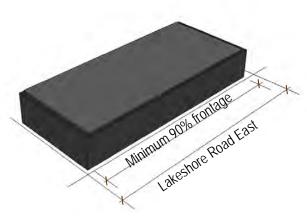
Buildings along Lakeshore Road East will have a minimum of 90% lot frontage
